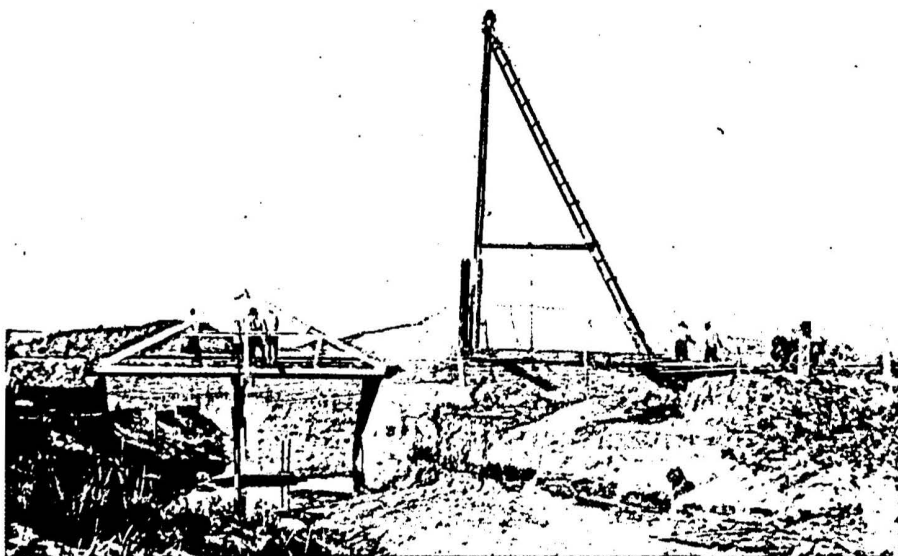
Timber King Post Truss Under Construction. Early bridge building in New Mexico was limited to local projects such as this king post truss. (Highway Department Bridge Files, Inactive)
